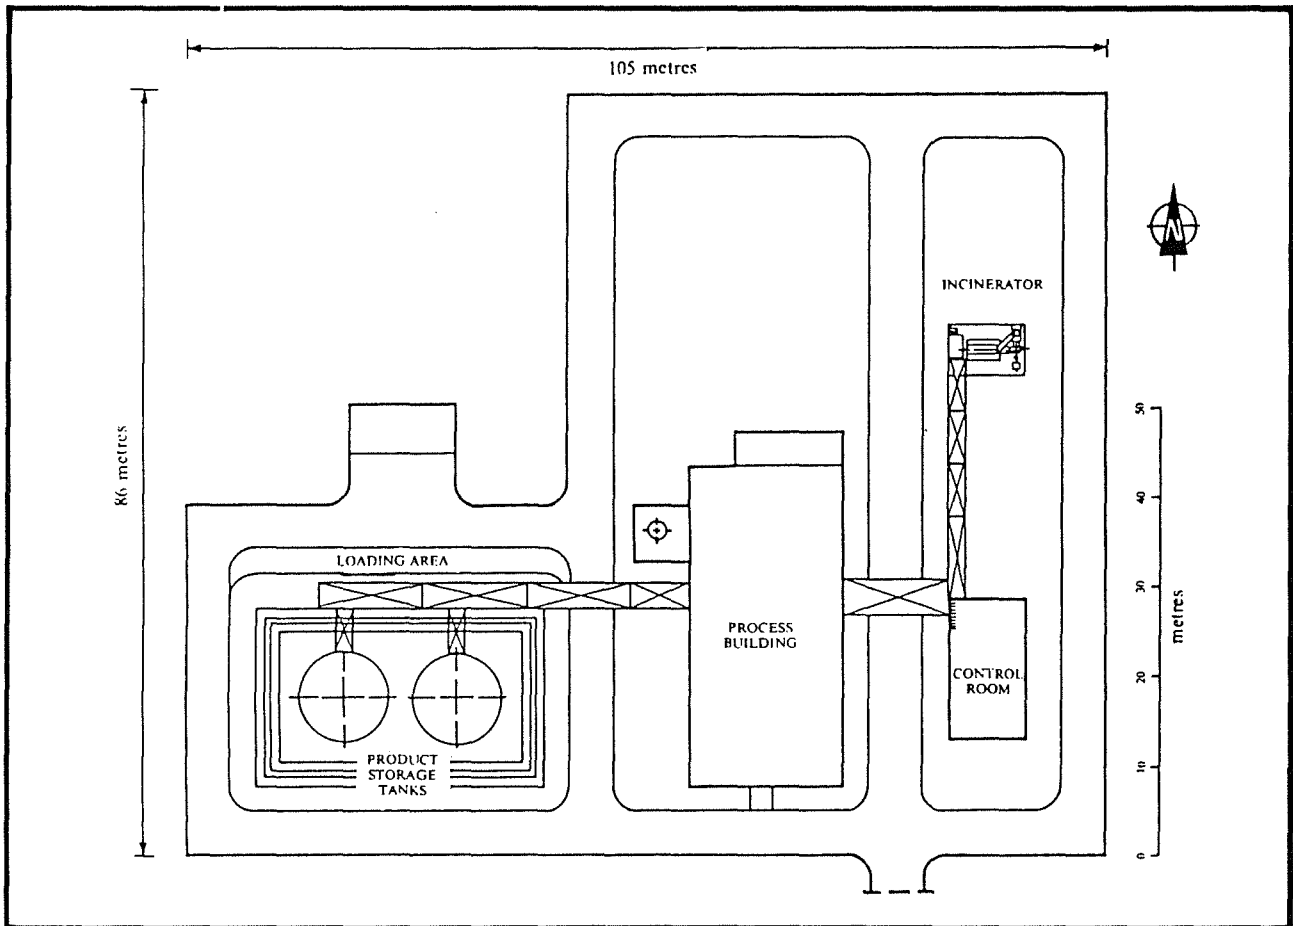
PLANT LAYOUT AND PERSPECTIVE
